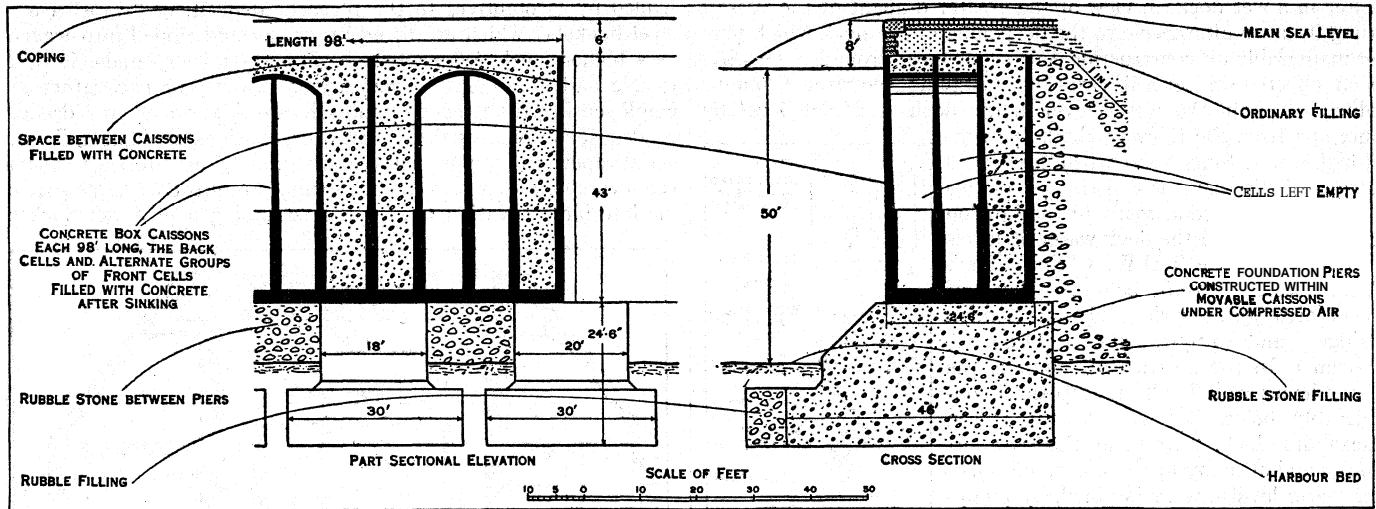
PRESIDENT WILSON BASIN, MARSEILLES. QUAY WALL OF CONCRETE CAISSONS ON DISCONTINUOUS CONCRETE FOUNDATIONS IN DEEP WATER
